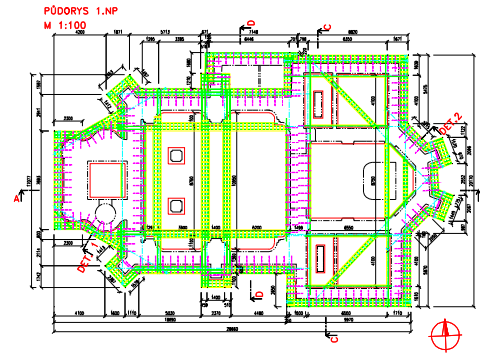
Layout Extension, Reinforcement, and Combination of Original and New Foundations.
